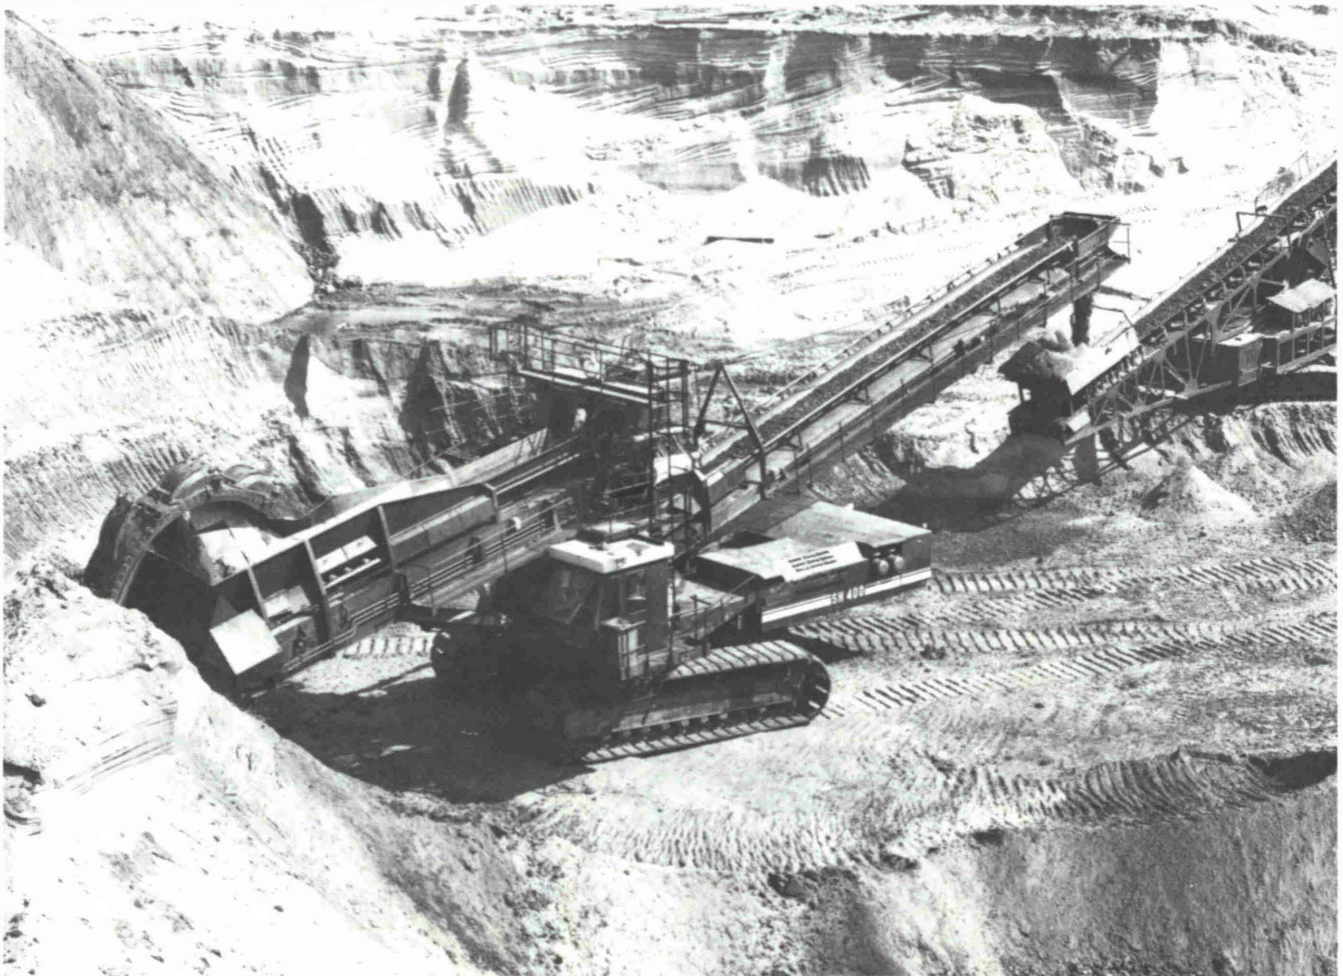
Bucket wheel excavator in the chalk pit Hemmoor
